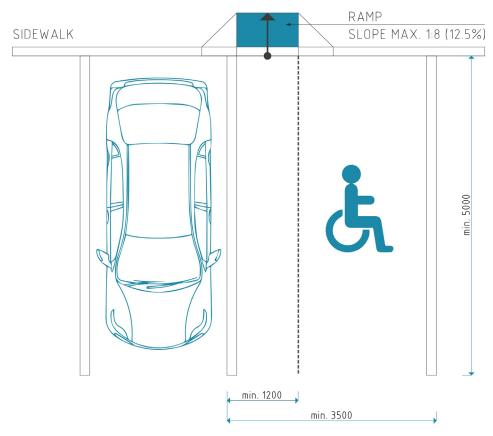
Parking space dimensions in transverse parking layout (Čerešňová, Suláková)
